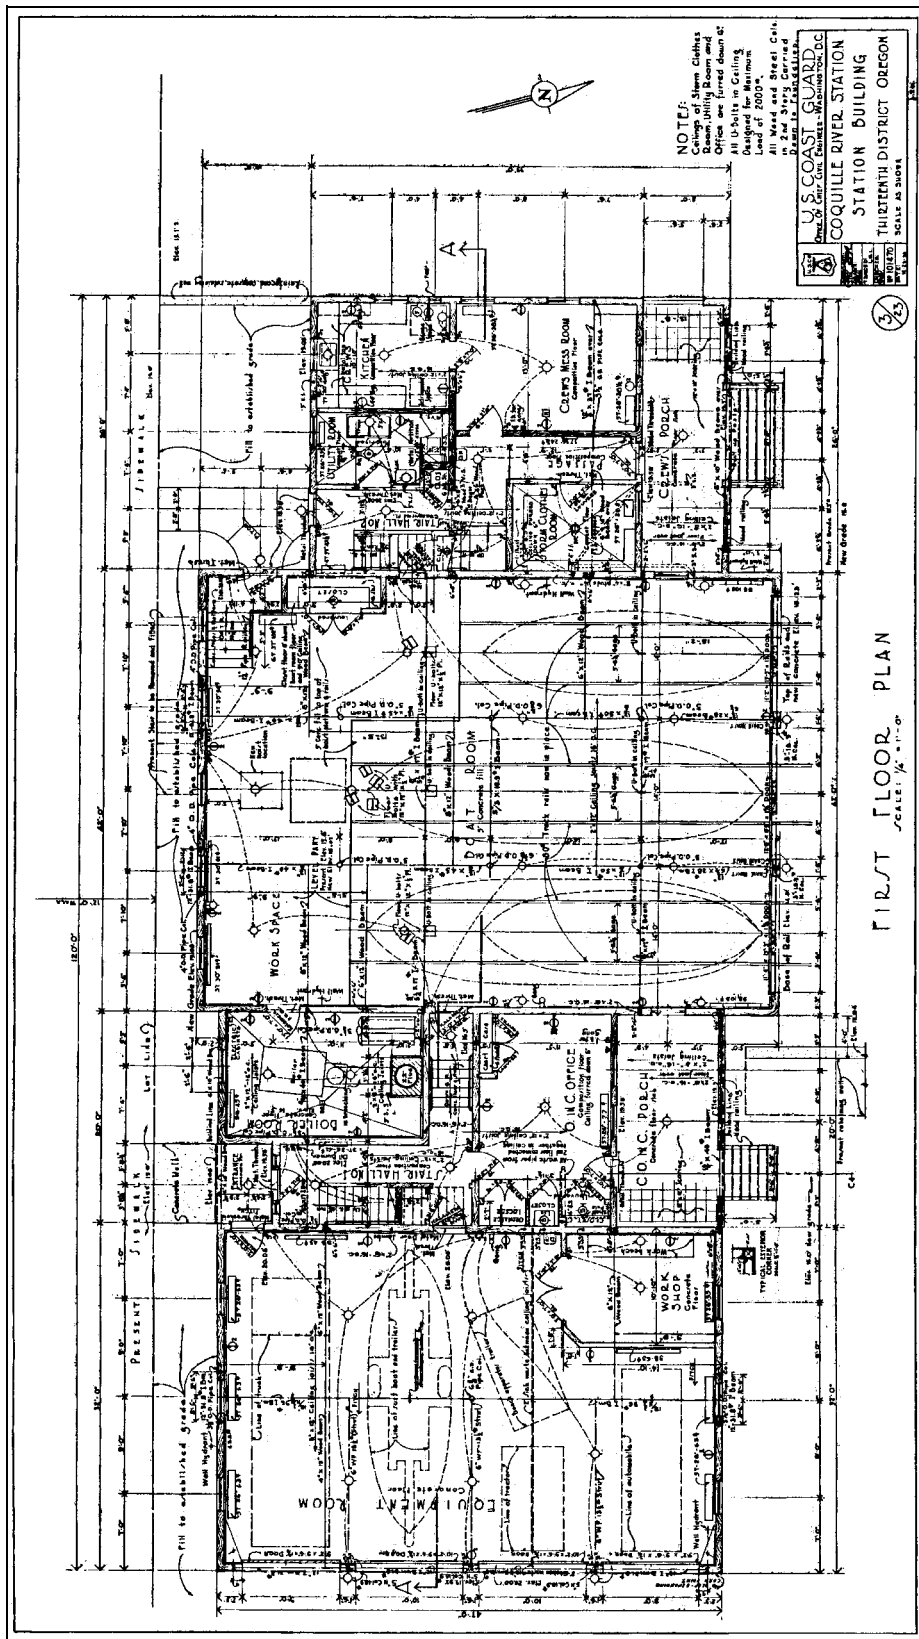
Coquille River Lifeboat Station, First Floor Plan, 1938. Source: U.S. Coast Guard Civil Engineering Unit, Oakland, CA.
